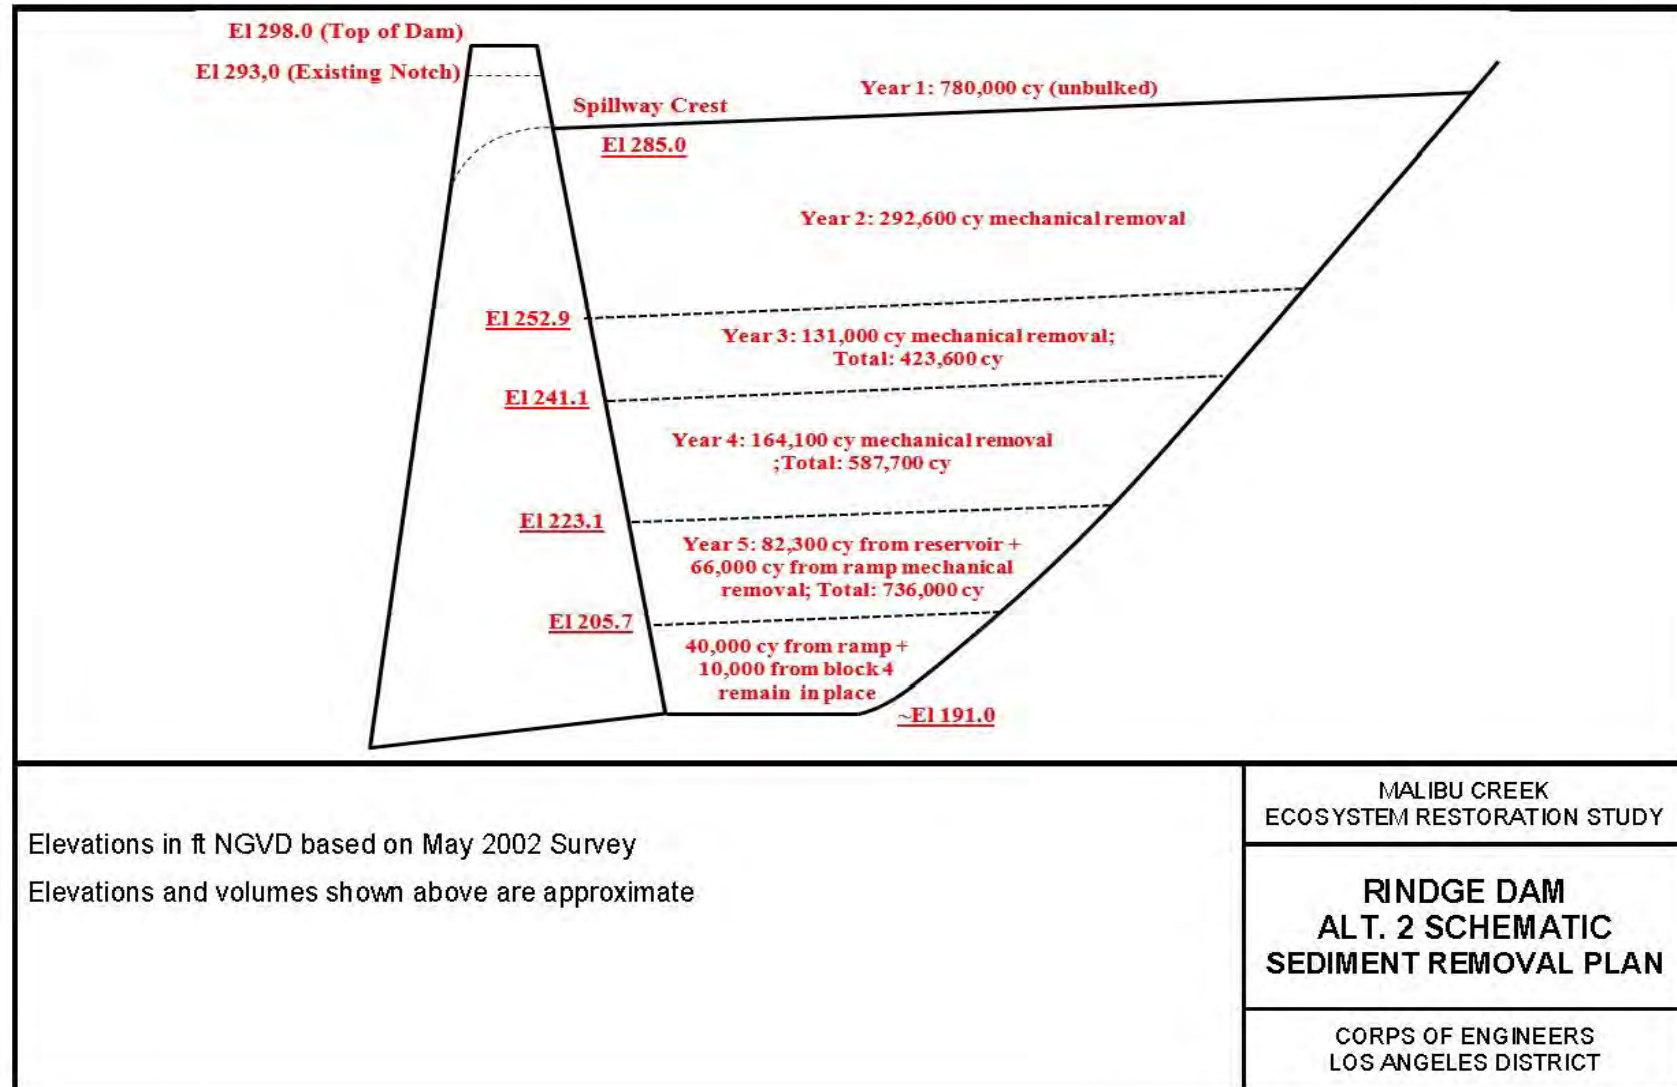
Rindge Dam - Alt. 2 Schematic Sediment Removal Plan
